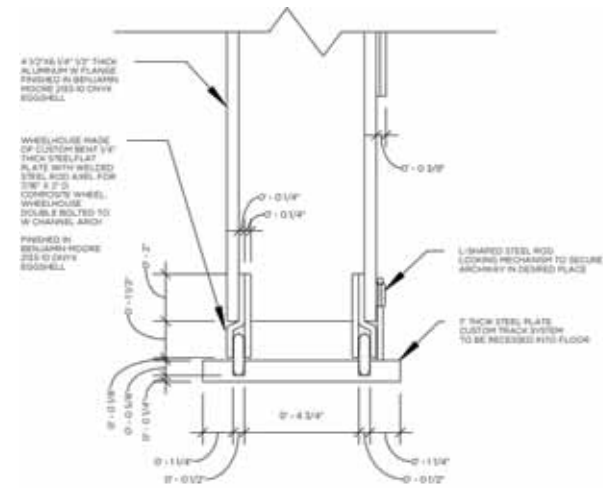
Detail Elevation - Archway System and Wheelhouse Mechanism Assembly
